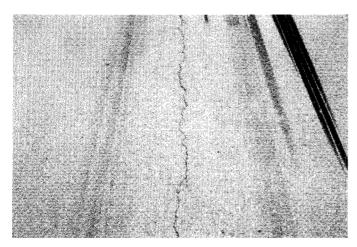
Low-Severity Joint Reflection Cracking, Nonfilled Crack
